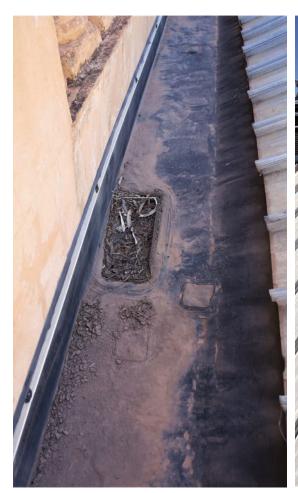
Above left: View of membrane-lined box gutter. Note the blocked roof outlet.
